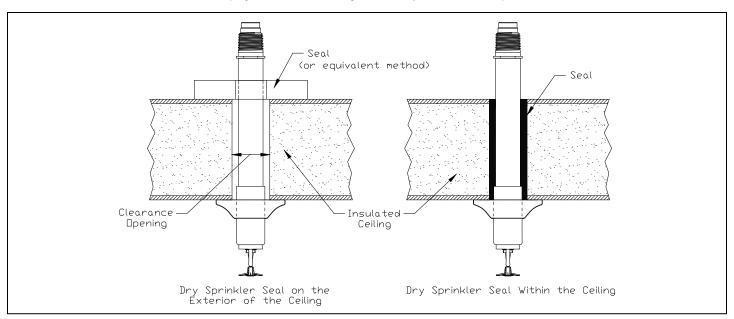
Dry Sprinkler Seal (Adjustable Standard Dry Pendent Sprinkler is Shown)
